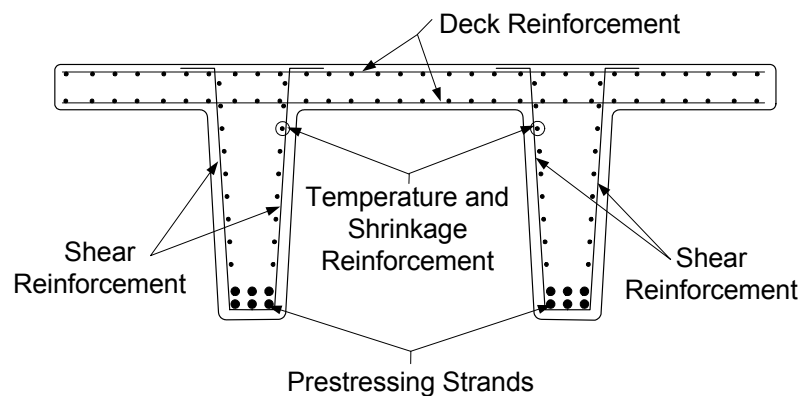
Steel Reinforcement in a Prestressed Double Tee Beam
